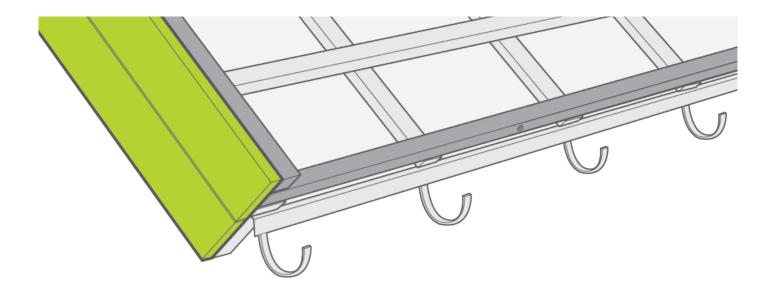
INSTALLING BATTENS FOR EAVES APRON AND FASCIA BOARD
